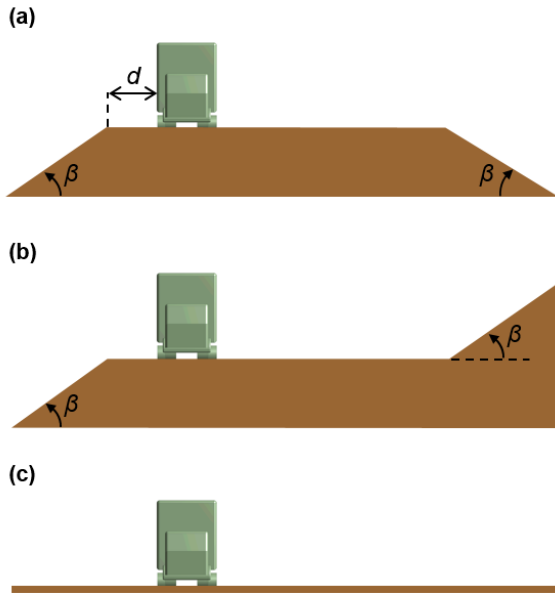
Truck model located on studied ground configuration: (a) type-1 embankment and (b) type-2 embankment and (c) flat ground
